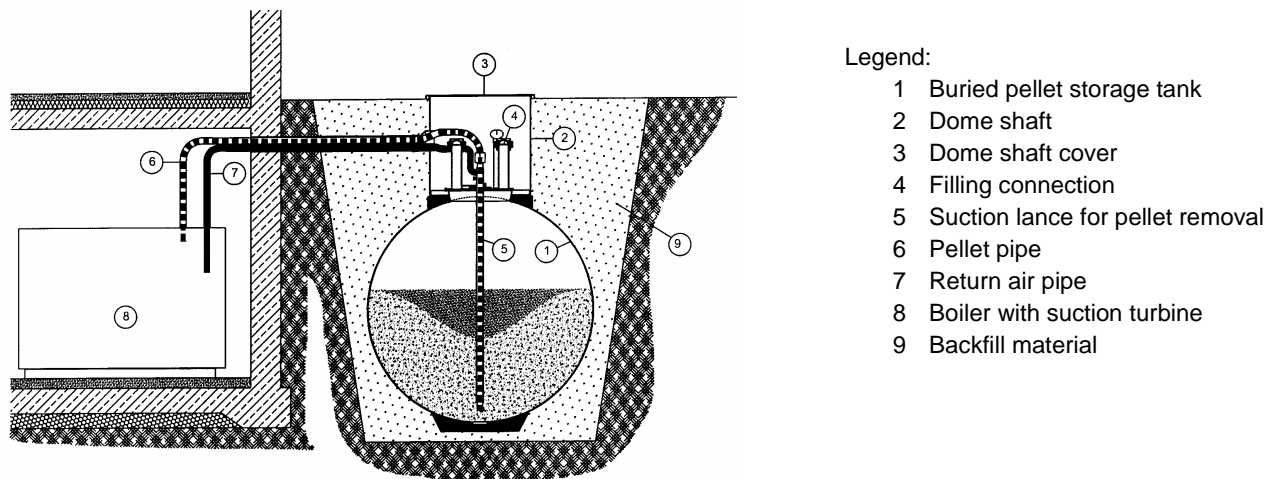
Storage tank for subterranean storage of wood pellets outside the building
